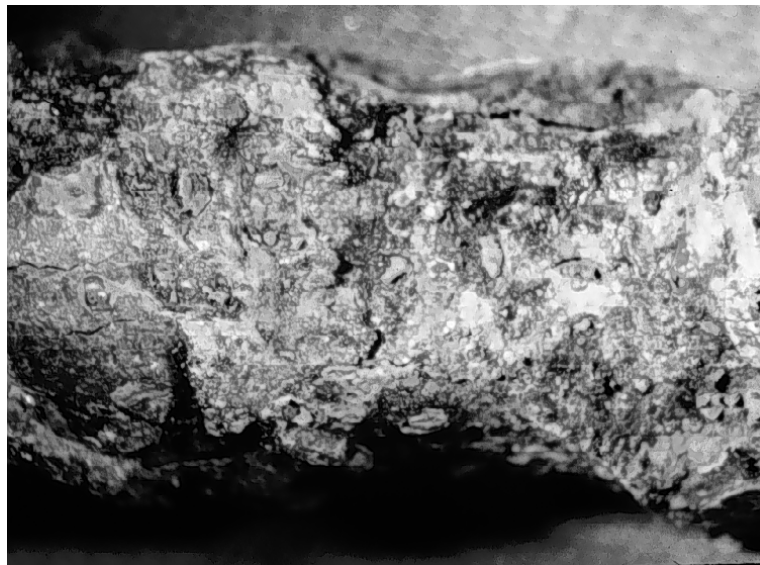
Stirrup trace in concrete adjacent to crack after one year.
